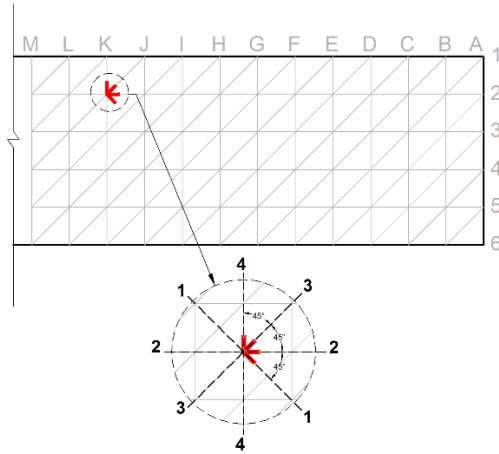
Typical concrete strain orientation on the surface of concrete beams
